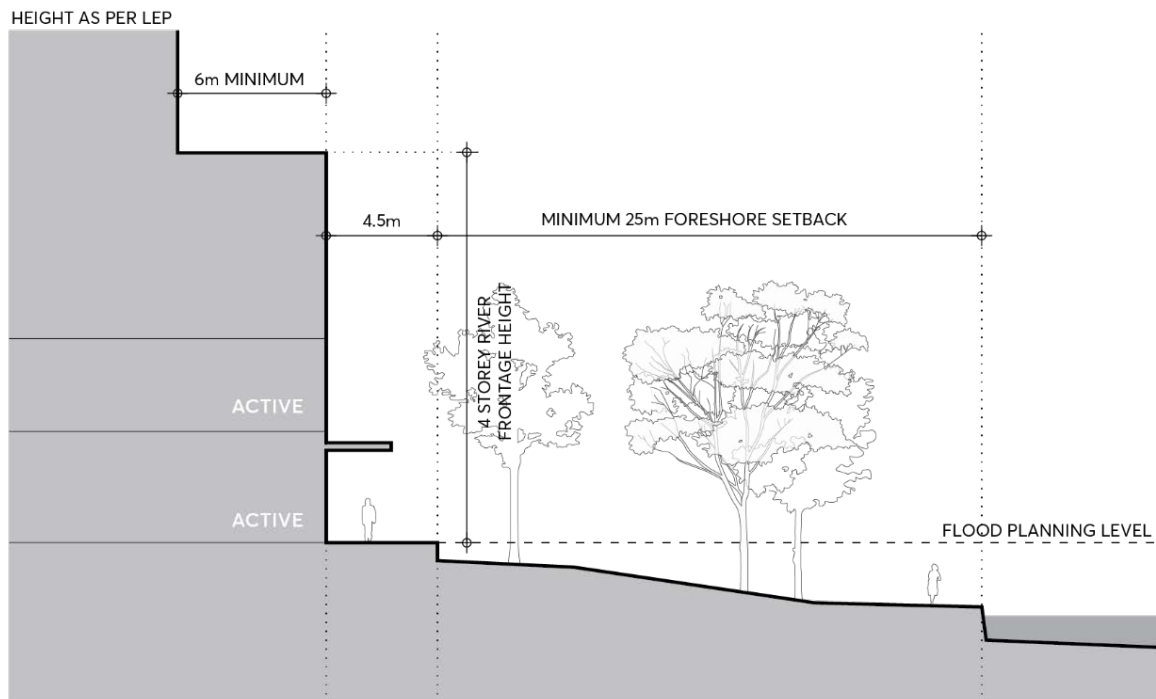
City East Block Typical River Frontage (Section A)
